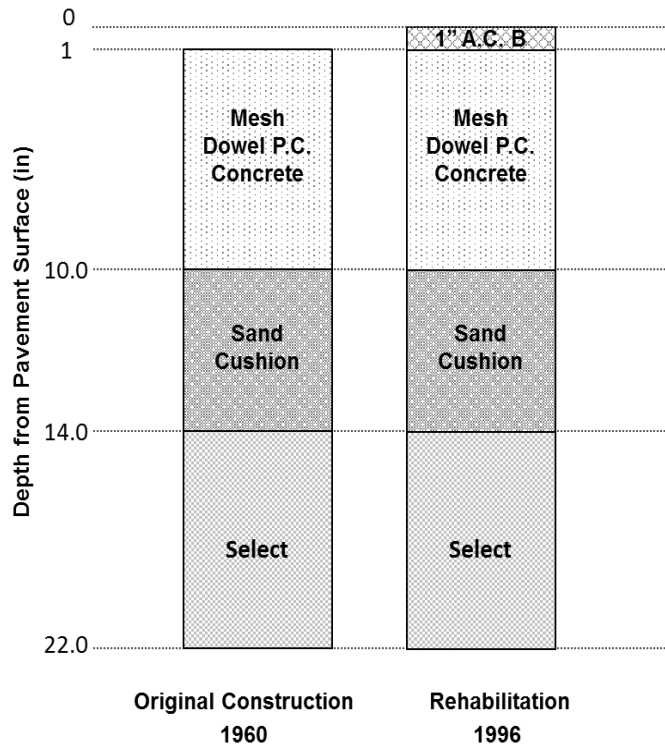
Structure Profile of Control Section 42-30 MP 7.09-12.7
